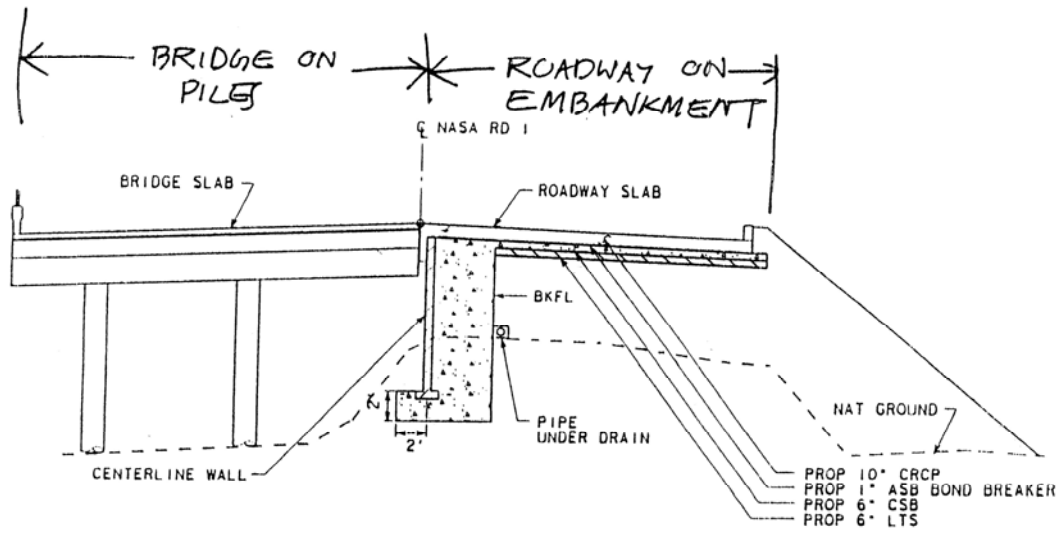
Cross Section of the Bridge and the Embankment at Nasa Road 1 Site.
